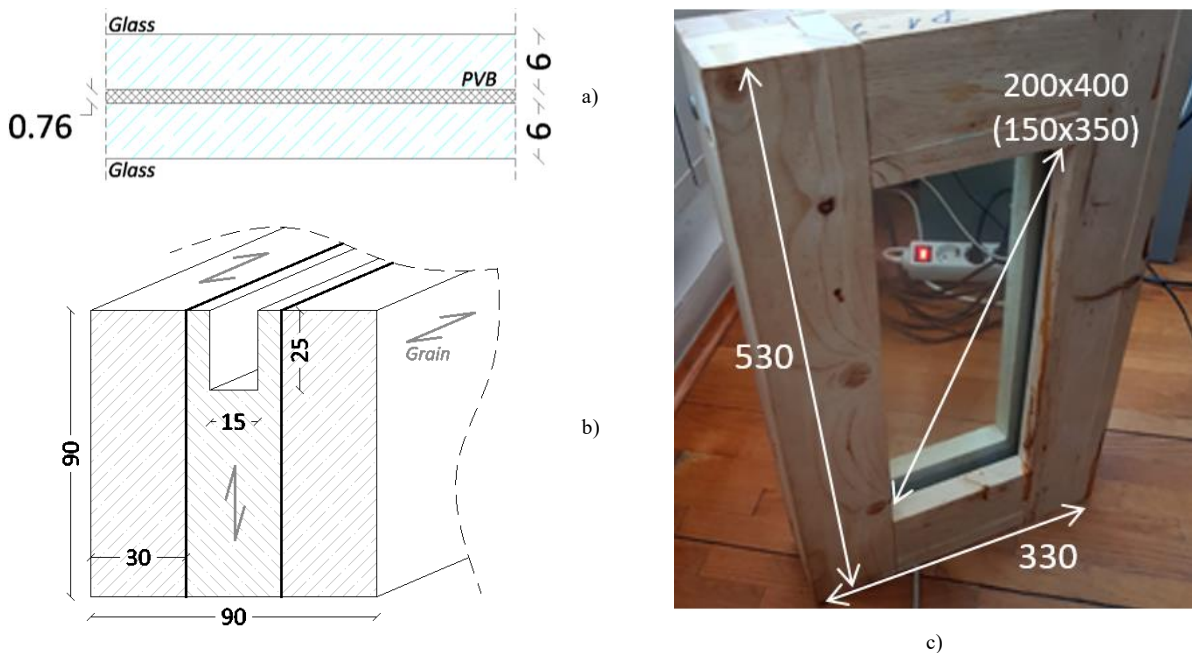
Small-scale specimens: a) nominal cross-section detail for laminated glass and b) CLT frame members, with c) final assembly (dimensions in mm).
